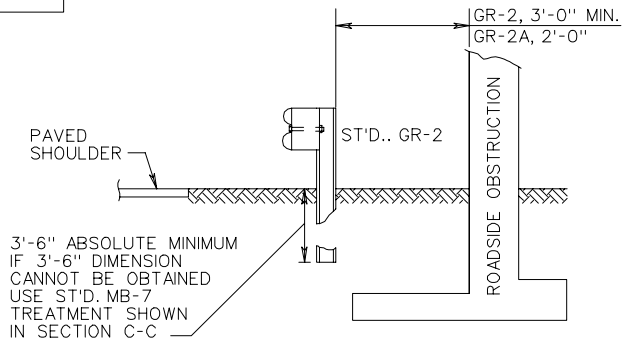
DETAIL OF GUARDRAIL AT DUAL BRIDGES
